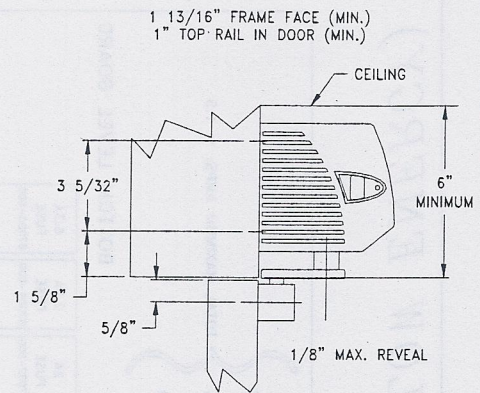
OPERATOR CLEARANCES – PULL ARM
